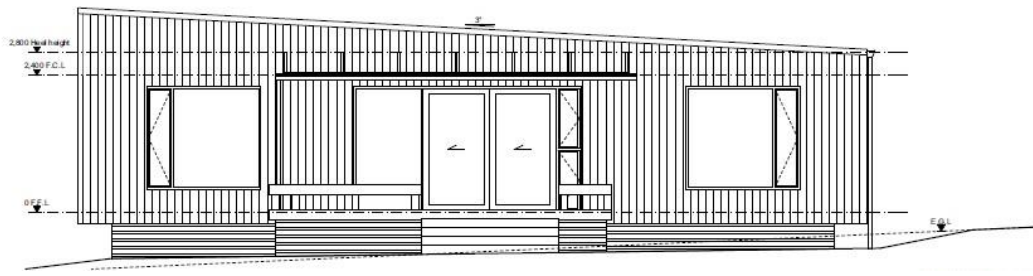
M-type Rotorua Thermal Holiday Park Bedroom Cabin, North Elevation, designed by Darryl Church Architecture.
